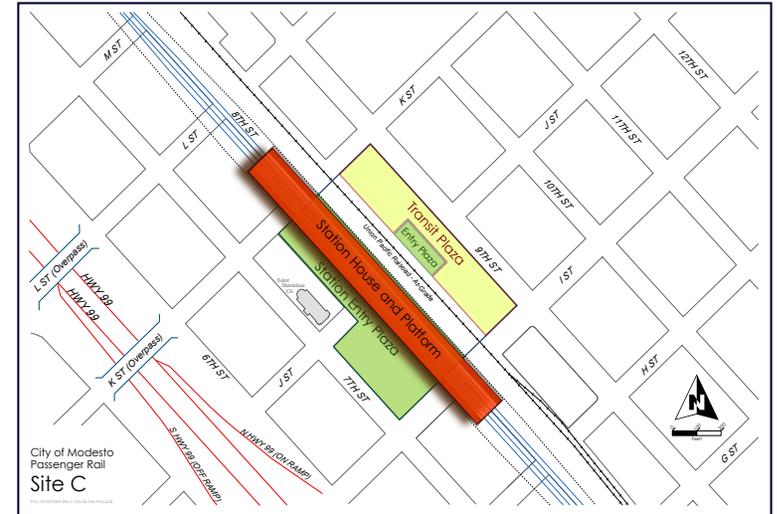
Conceptual Site Plan, At-Grade Passenger Rail Service
